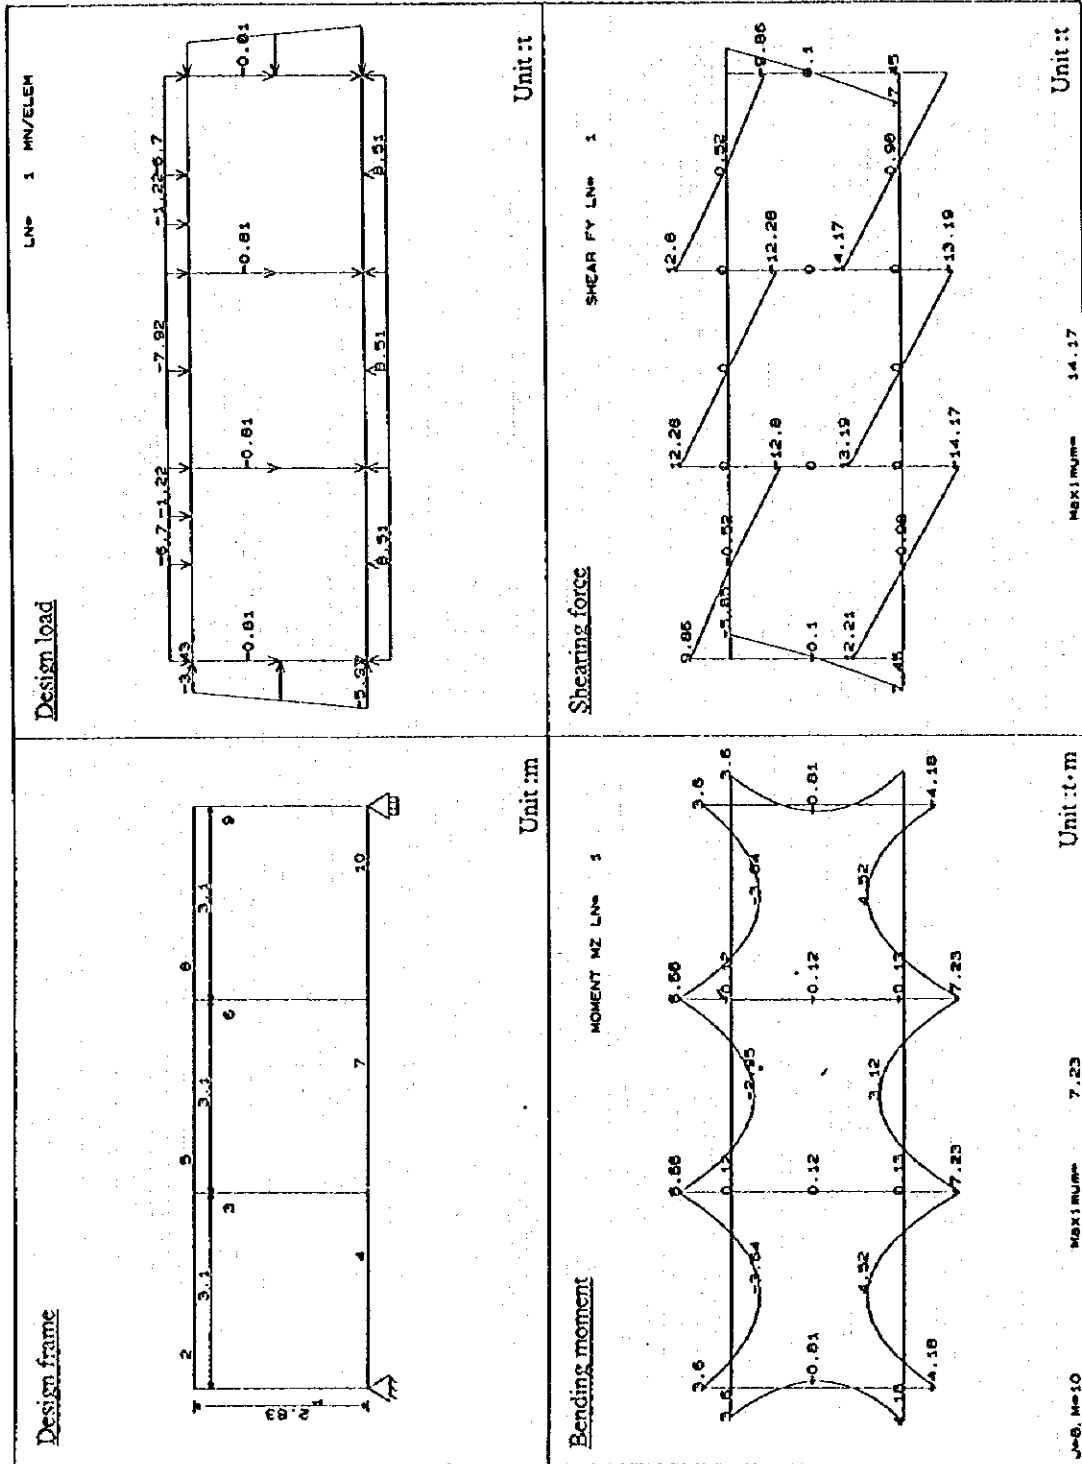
Stress Analysis on Transverse Section of Sluiceway Conduit (11/12)
